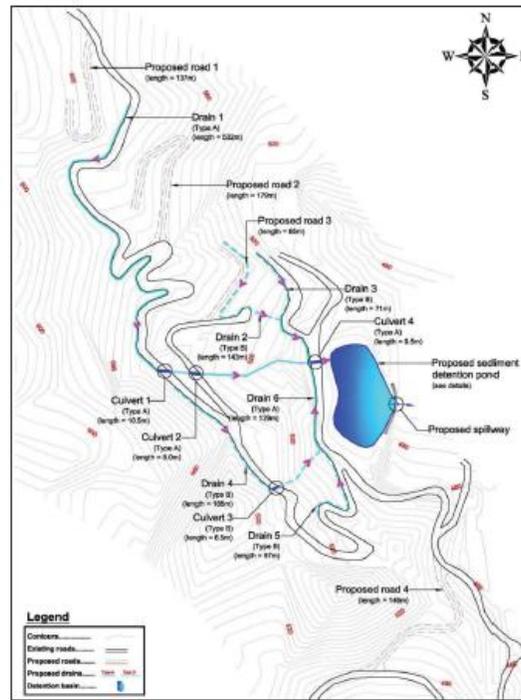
Proposed layout of drainage including earth swales, culvert crossings and detention pond
